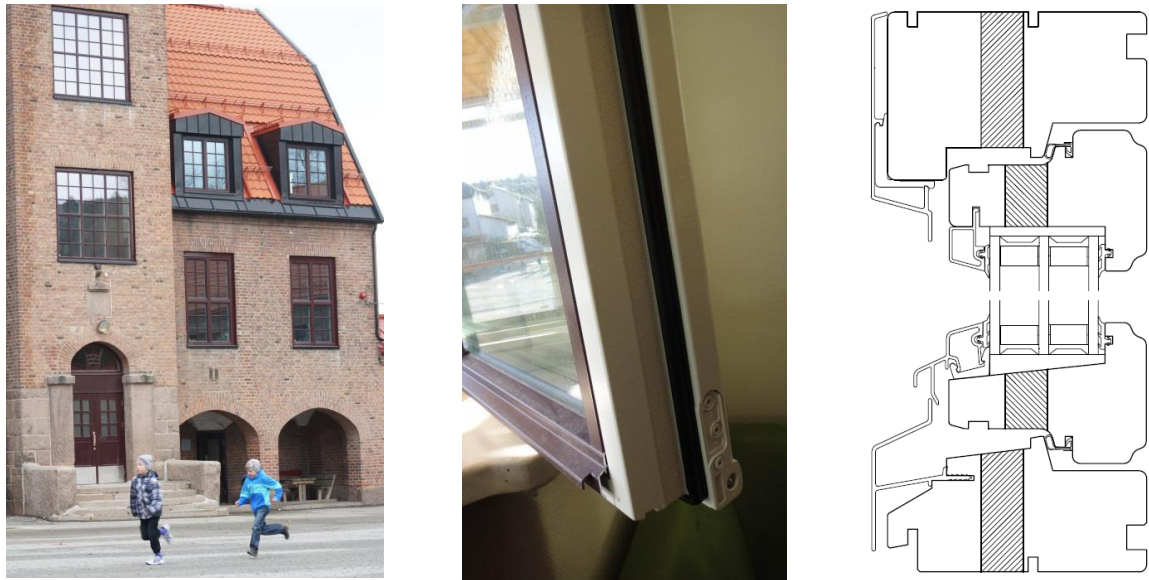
(a) Façade segment showing new passive house windows from NorDan; (b) Close up photo of new window. Photos: S. Røgeberg, Mai 2012; (c) Vertical section of insulated window frames.
